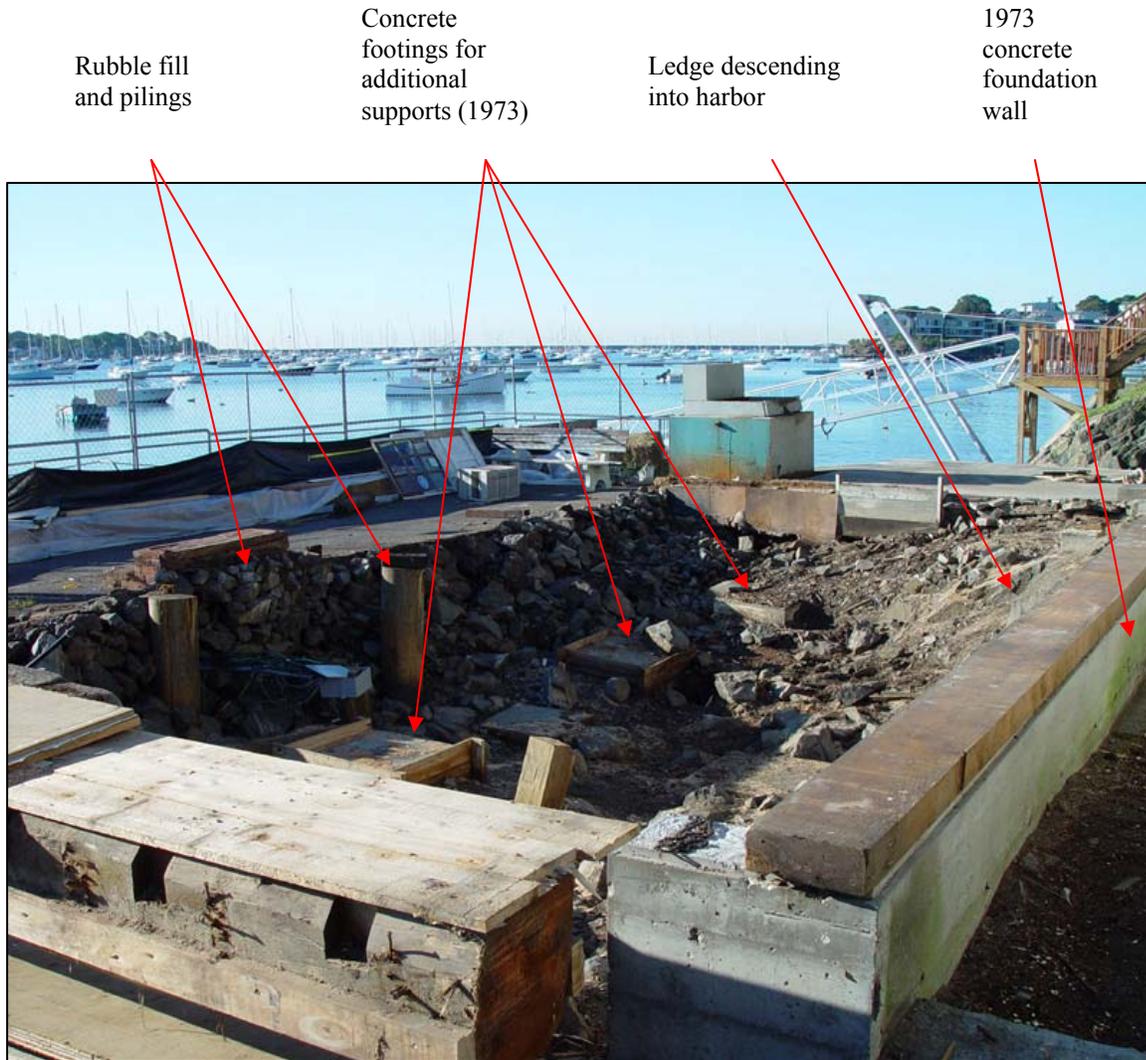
Disassembly, view of foundation and crawlspace, looking southwest. Floor framing removed.
